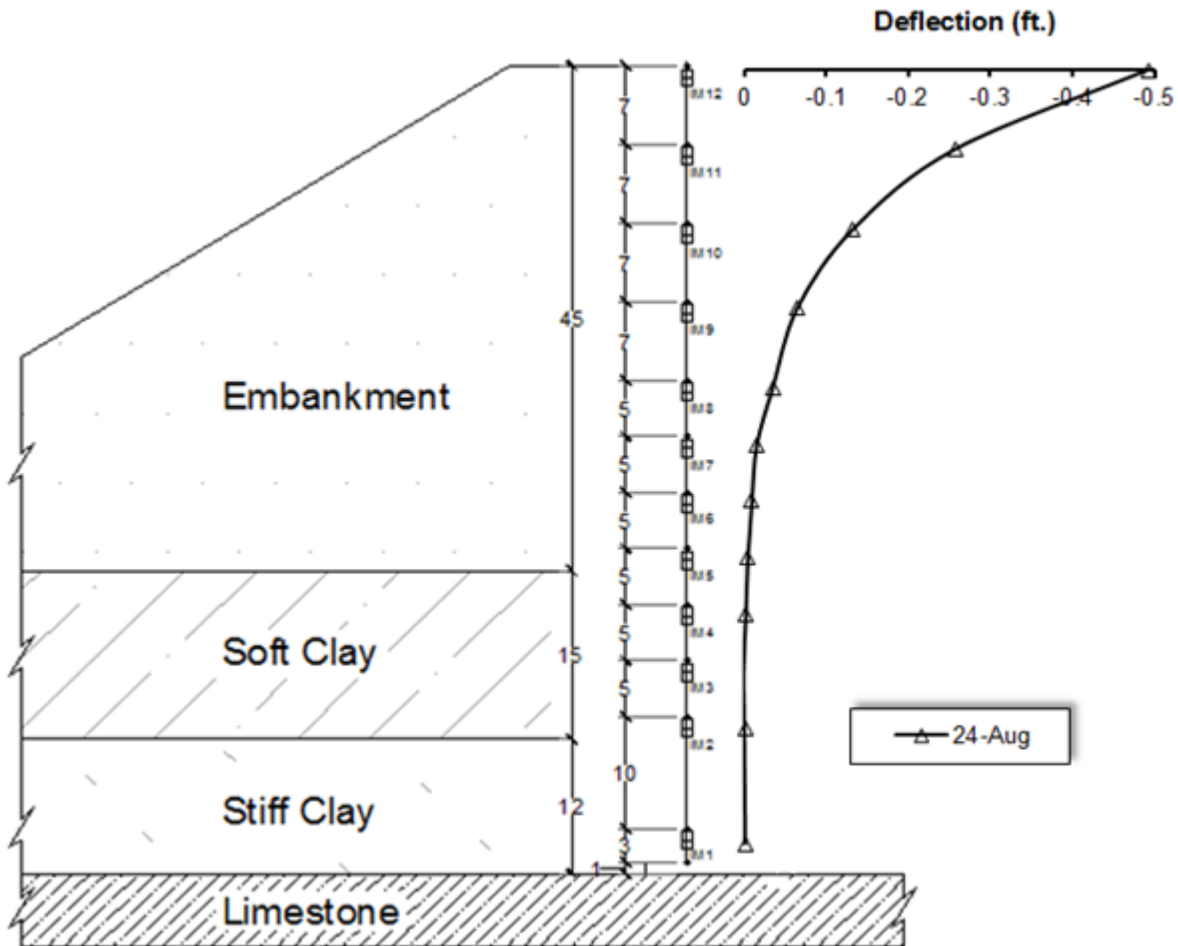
SH-3 bridges over BNSF railroad – eastern embankment deflection profile on August 24, 2013
